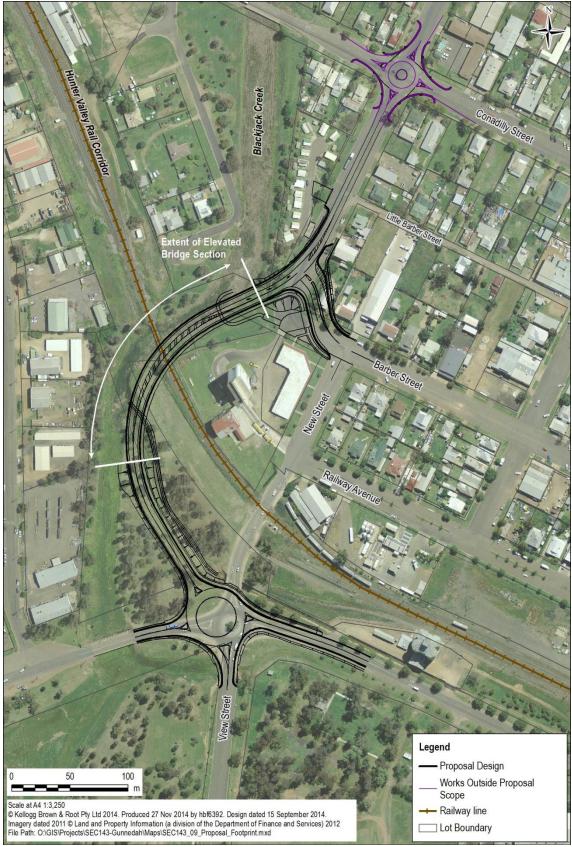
PROPOSED ALIGNMENT AND LAYOUT
